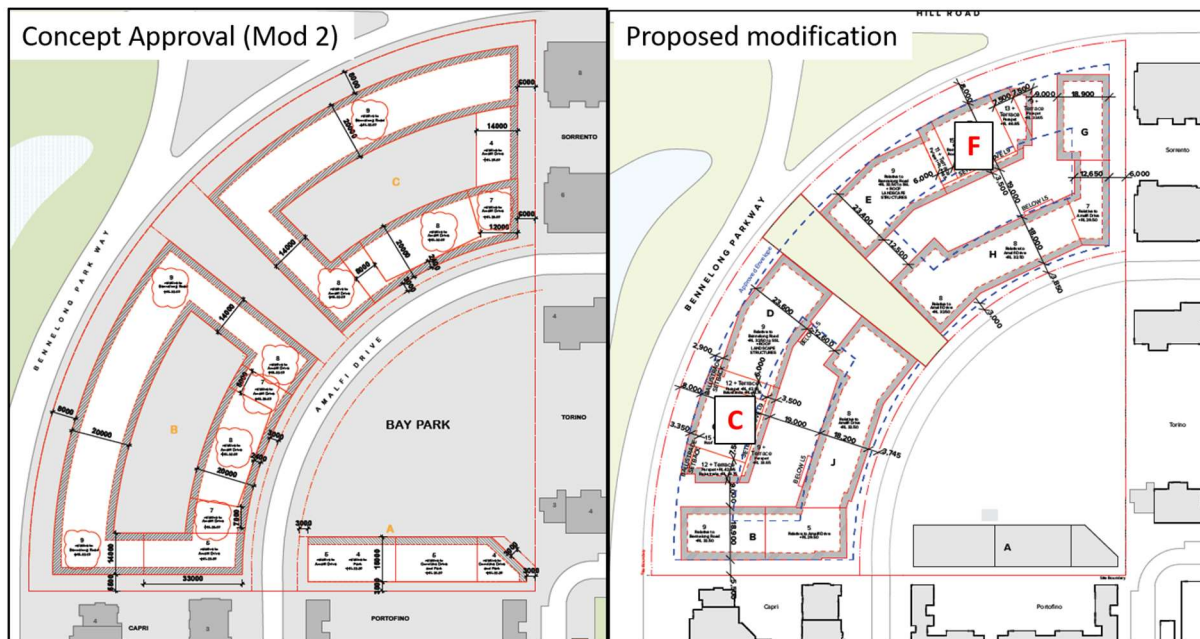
| Concept approval urban form (left) and proposed modification (right) (Source: approved and submitted plans)
